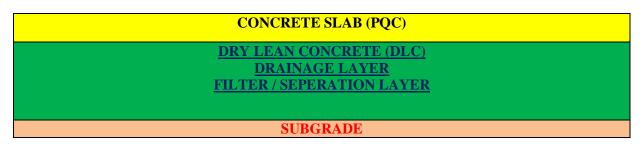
Typical cross section of concrete pavement (Source : IRC:58-2011)
